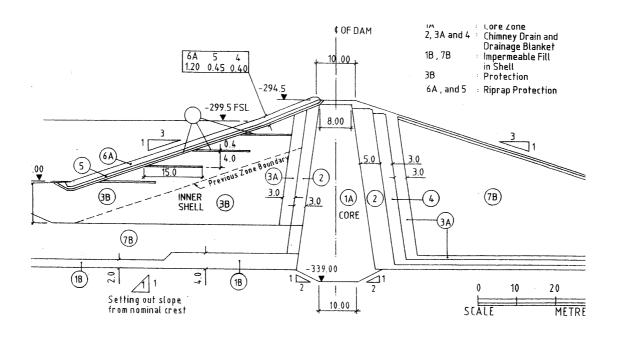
Main Zones of a Typical Cross-Section of Karameh Dam.
